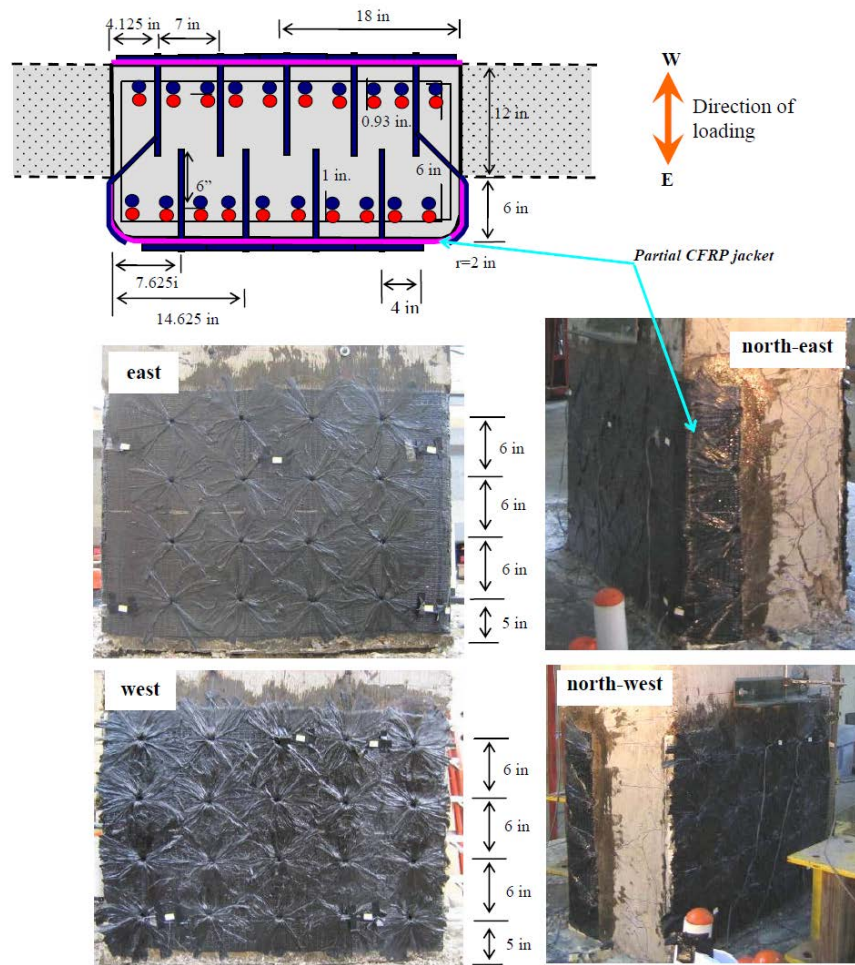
Layout of the CFRP jackets and CFRP anchors, specimen 6-C-R20-C (Kim 2008)
